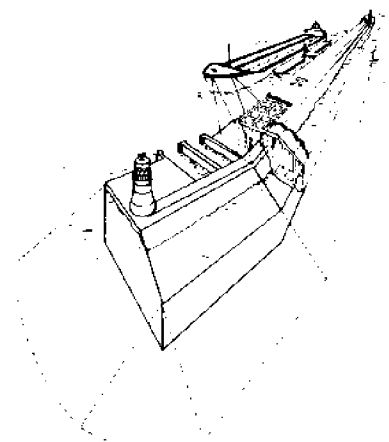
Proposed Offshore Terminal of Concrete Construction.
